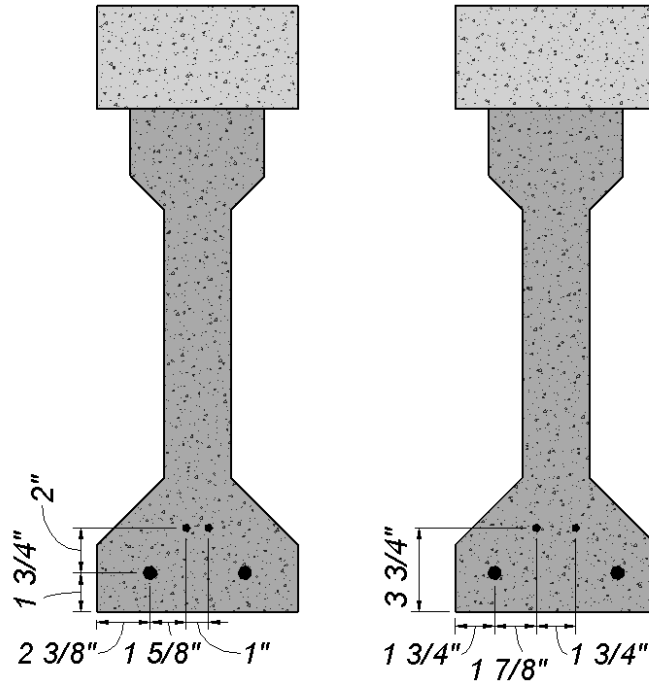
(Left) Inside Longitudinal Bars; (Right) Outside Longitudinal Bars
